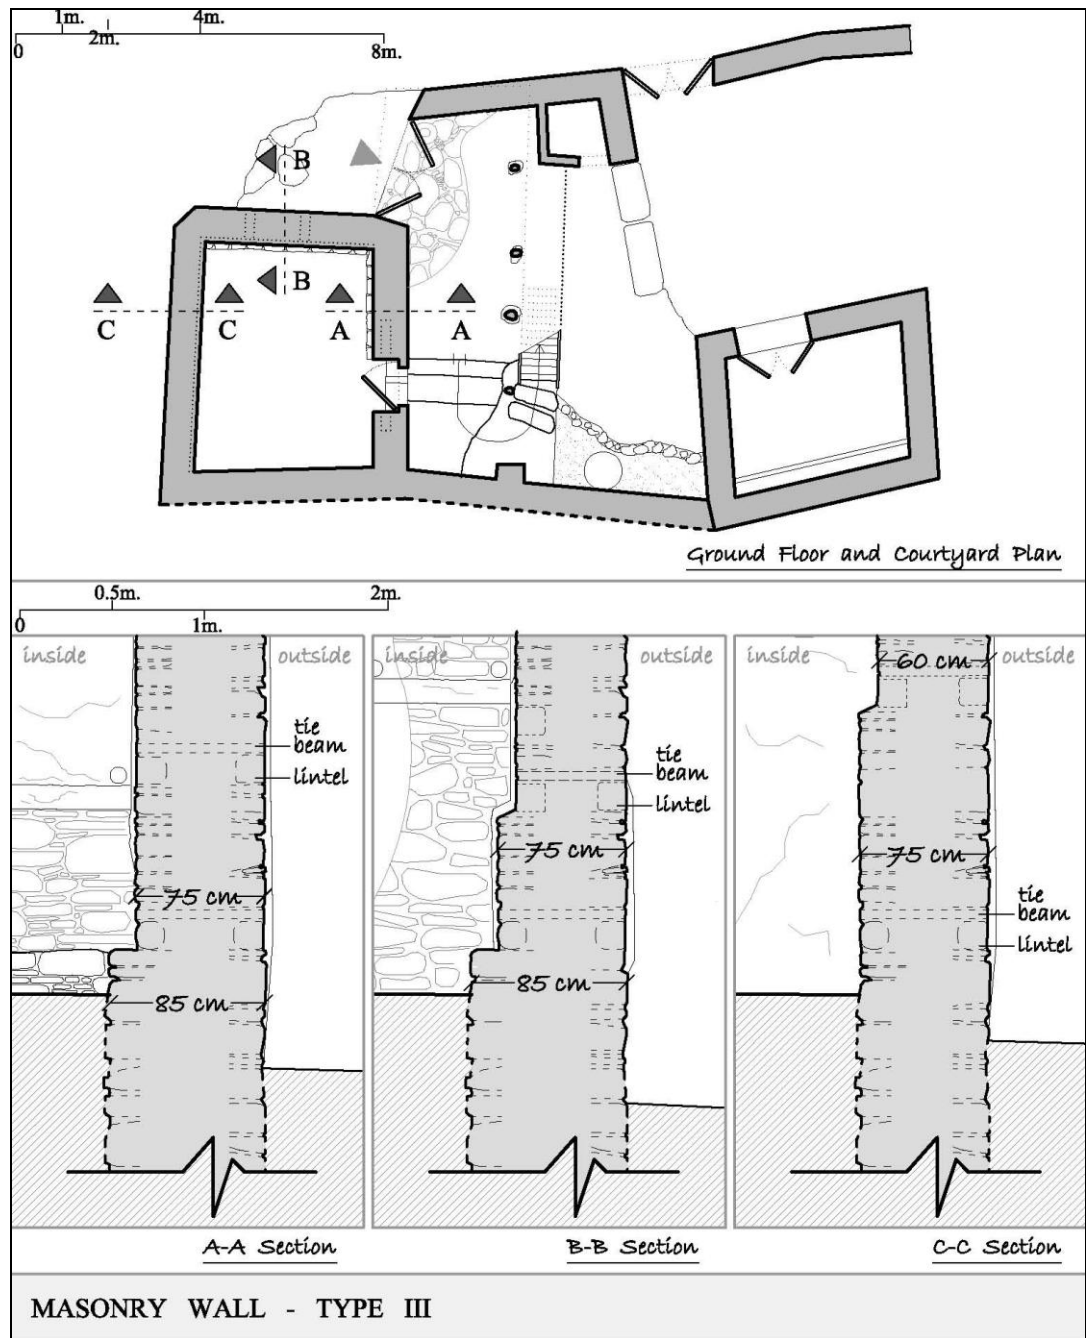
, Drawings of masonry wall Type III (Camikebir Quarter 3. Beyzade Street No:15)
